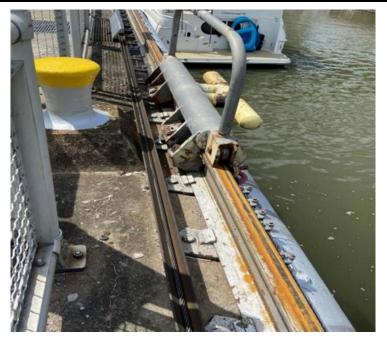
Existing Chickamauga Lock – rail located at top of the lock wall; towing bitt with horn assembly at 0 degree with the horizontal plane
